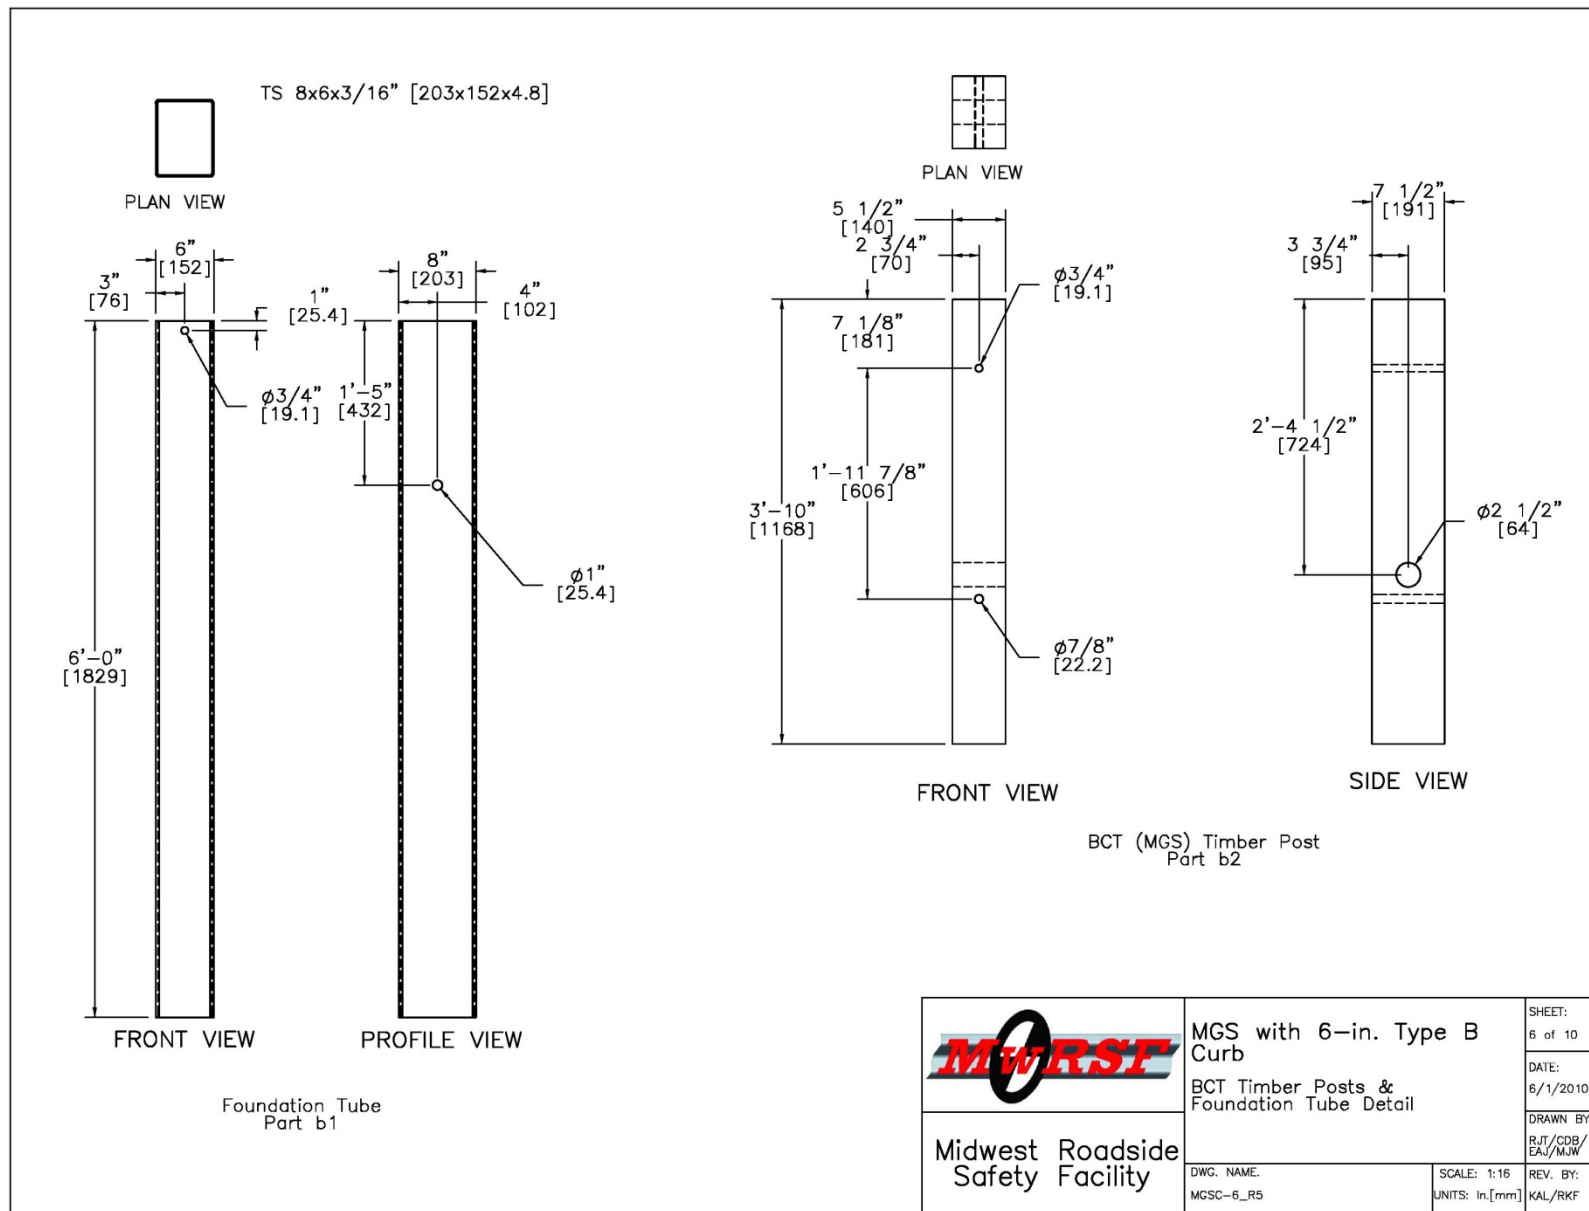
BCT Timber Post and Foundation Tube Details, Test No. MGSC-6
